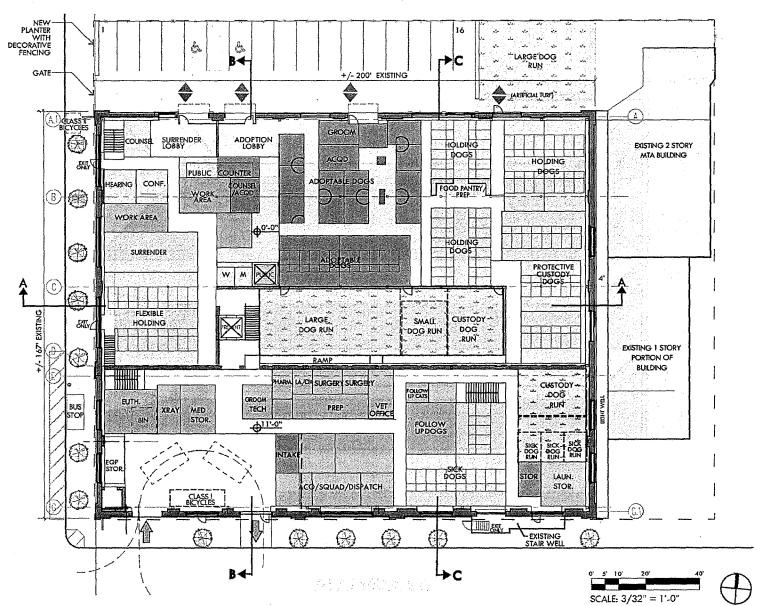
(b) – Proposed Floor Plans (2nd Floor)
